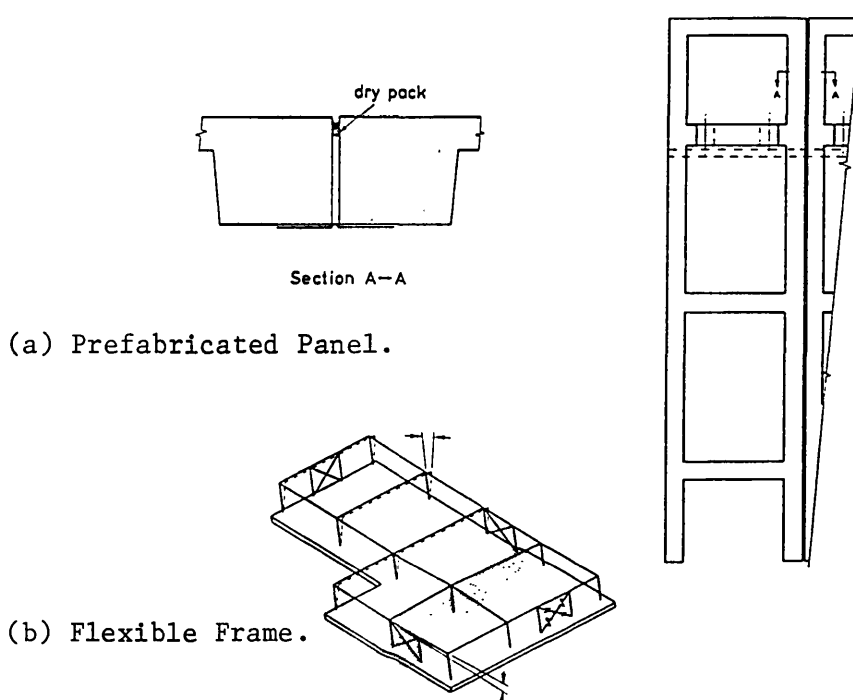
Use of flexible panels and frames to accommodate ground movement. Diagram(a) shows the movement joint between adjacent panels. Diagram(b) shows the use of spring bracings to ensure verticality of the frame (adapted after Barber,1969 ; Rodin,1969).
